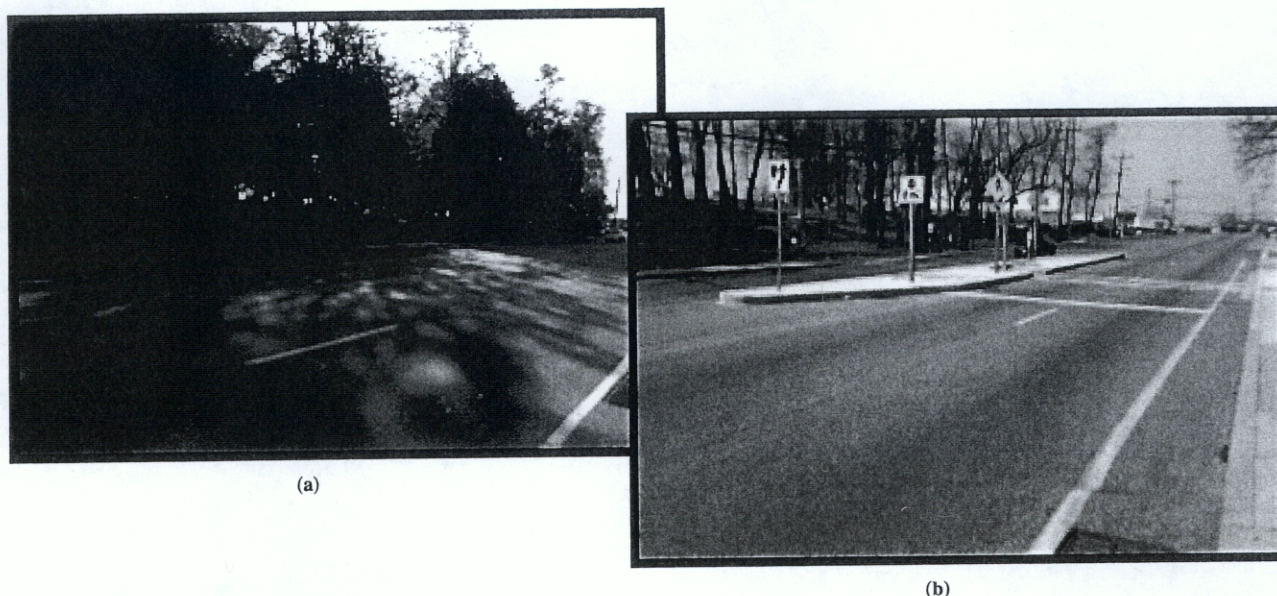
New midblock crosswalk installed on Piney Branch Road: (a) before and (b) after.
